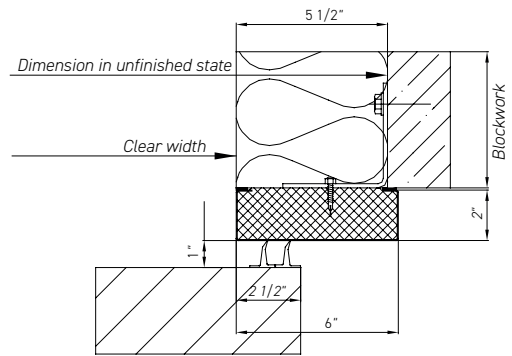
Blockwork / Flat frame, bracket mounting
